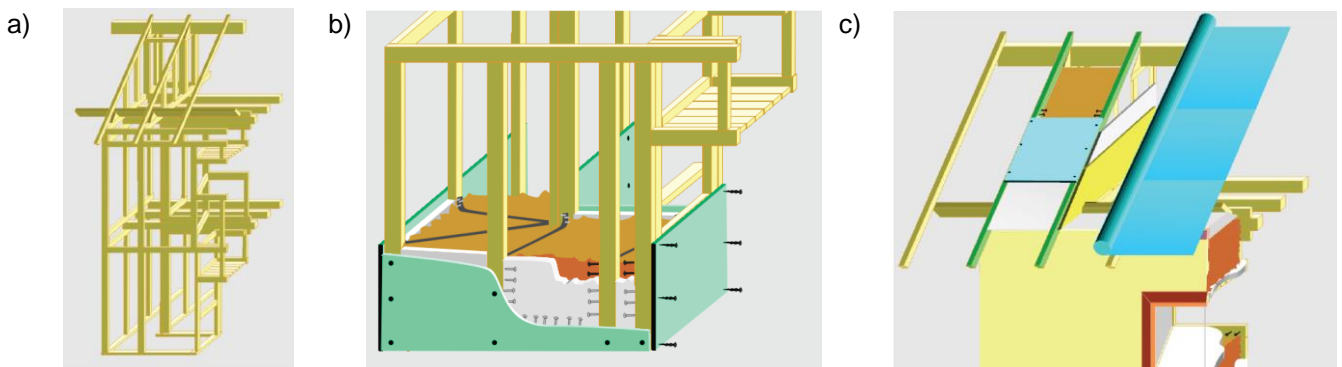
Wooden frame structure straw bales (a), reinforcement with screws, nails and iron strap, lightweight mortar (b), assemble of filling wall and roof (c)
